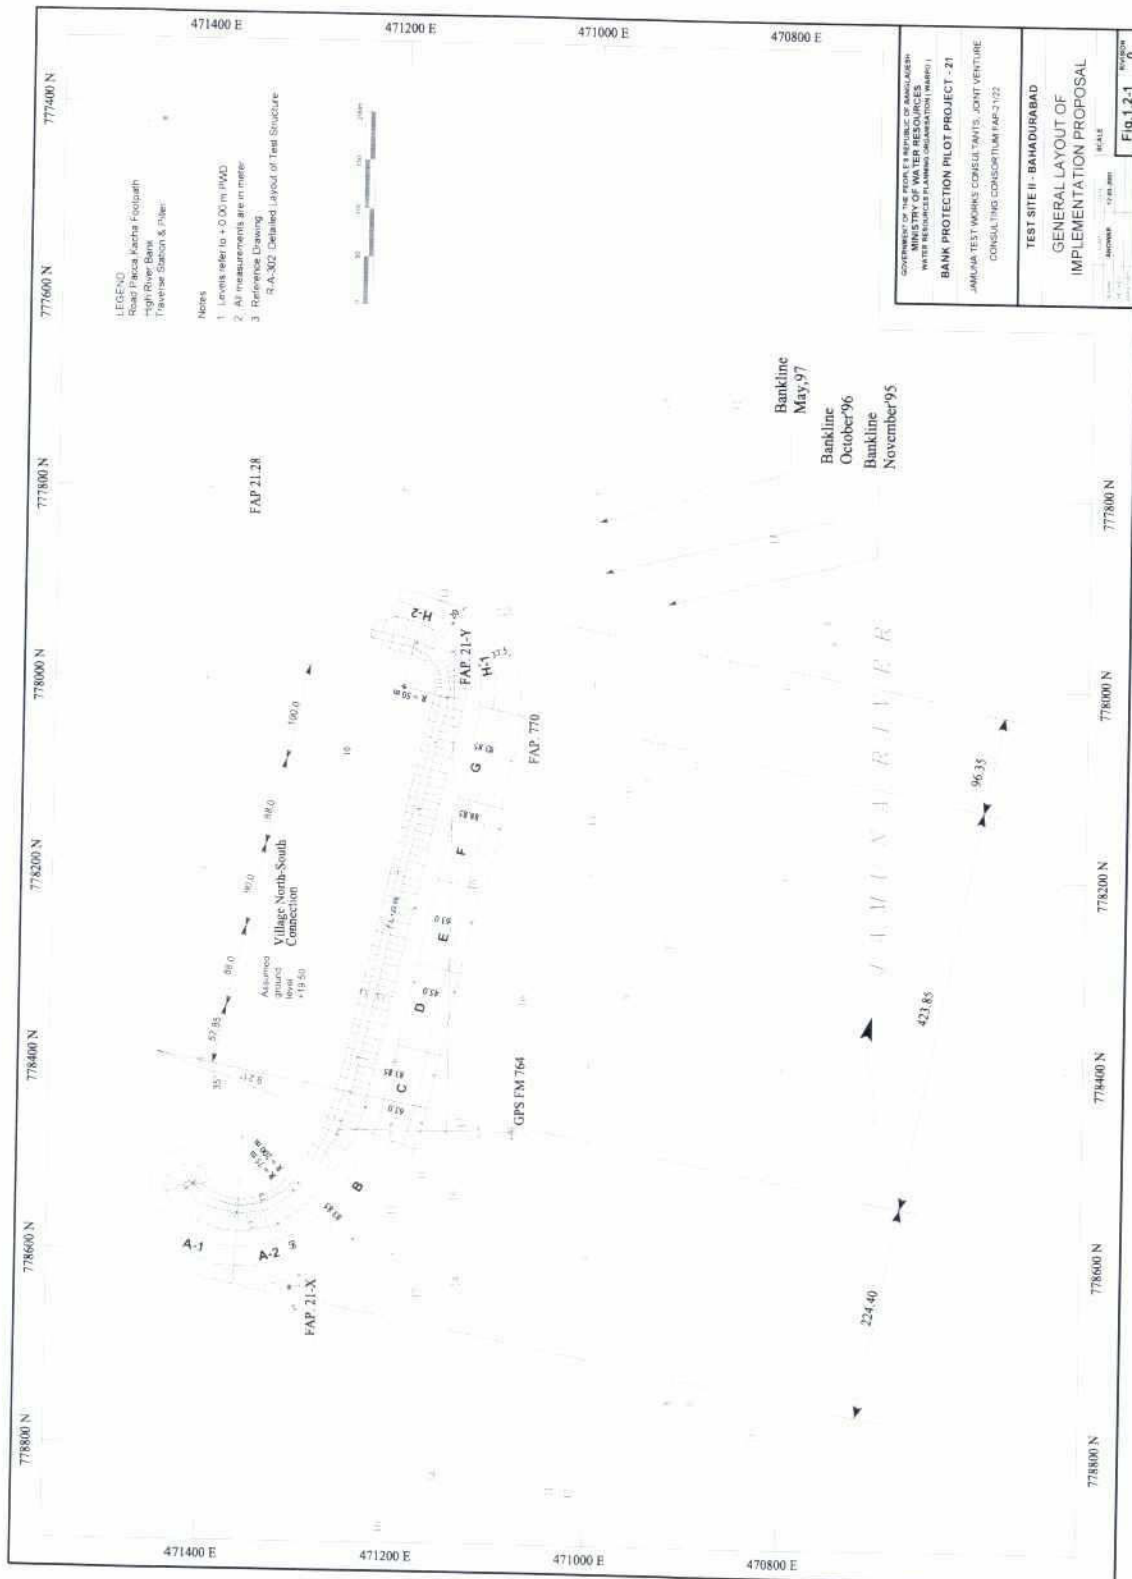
General Layout of Implementation Proposal – Test Site II
